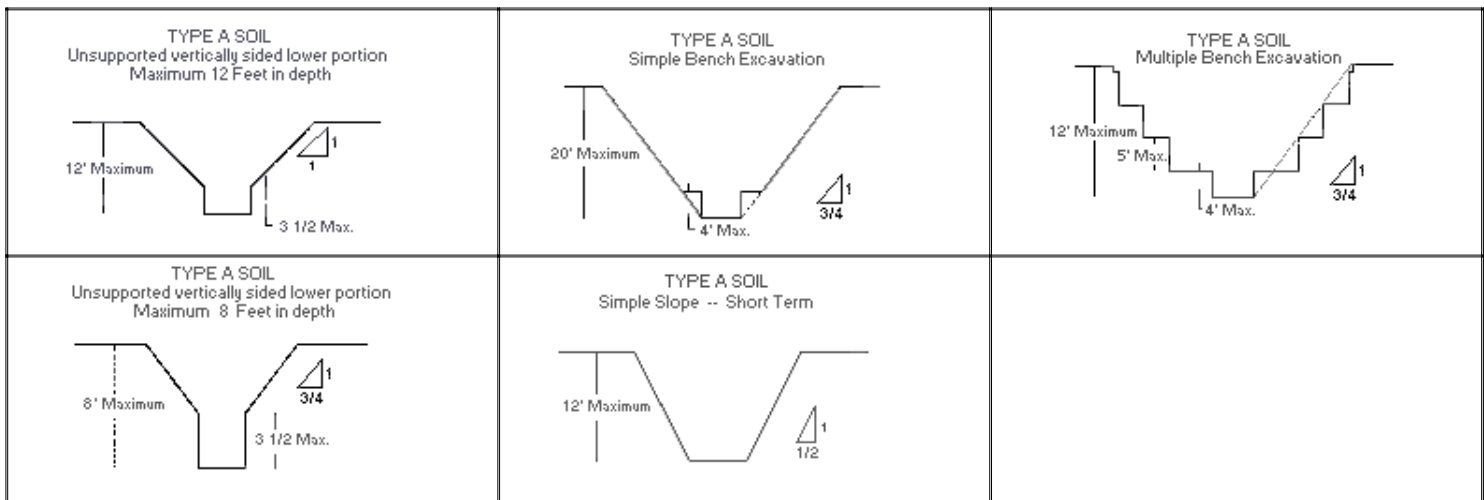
EXCAVATIONS MADE IN TYPE A SOIL
